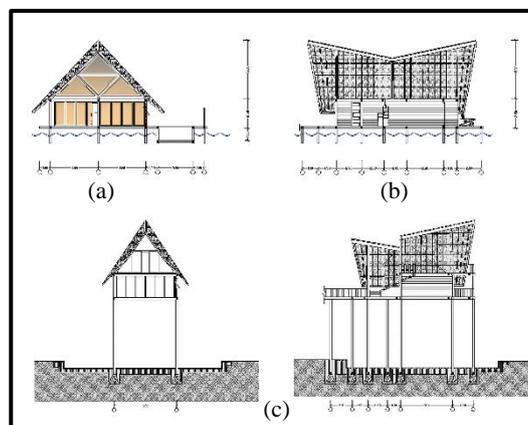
(a) Deluxe Room View; (b) Section of Deluxe Room; (c) Sections of Standart Room
